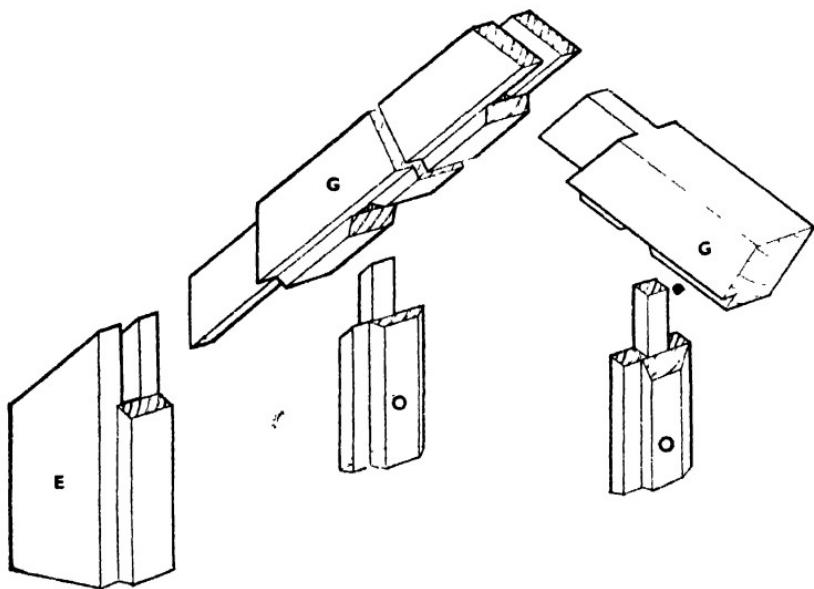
JOINTS USED IN SLOPING MEMBERS OF END.
